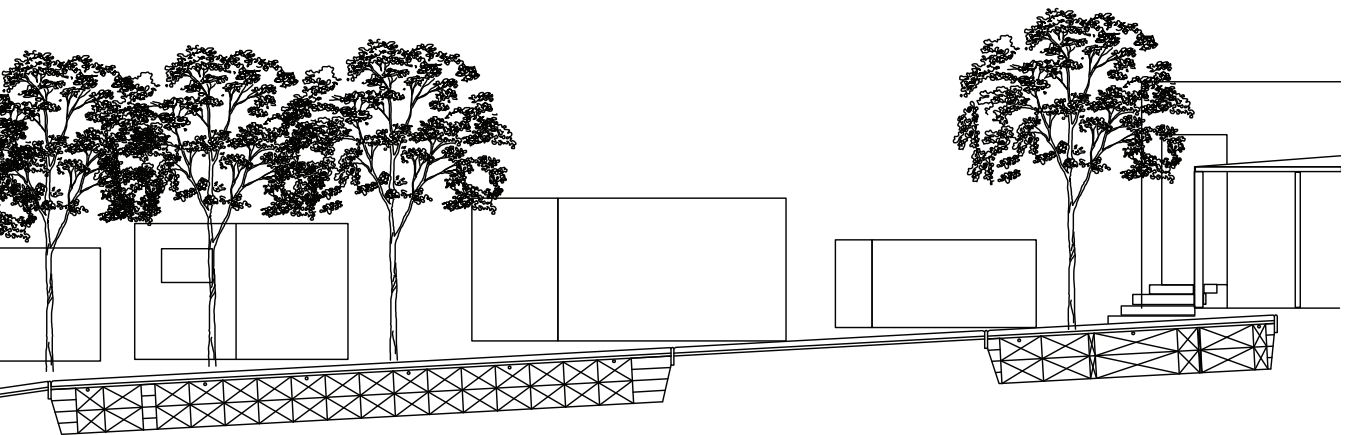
Section through Store Area cutting through two suspended pavement soil reservoirs (Author 2015)
